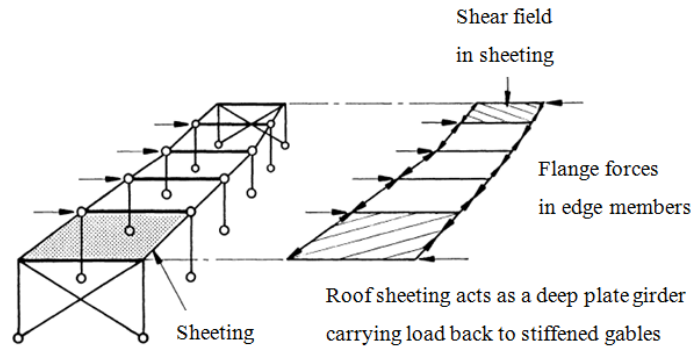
Stressed-skin action under horizontal load buildings (Davies, Bryan 1982)
